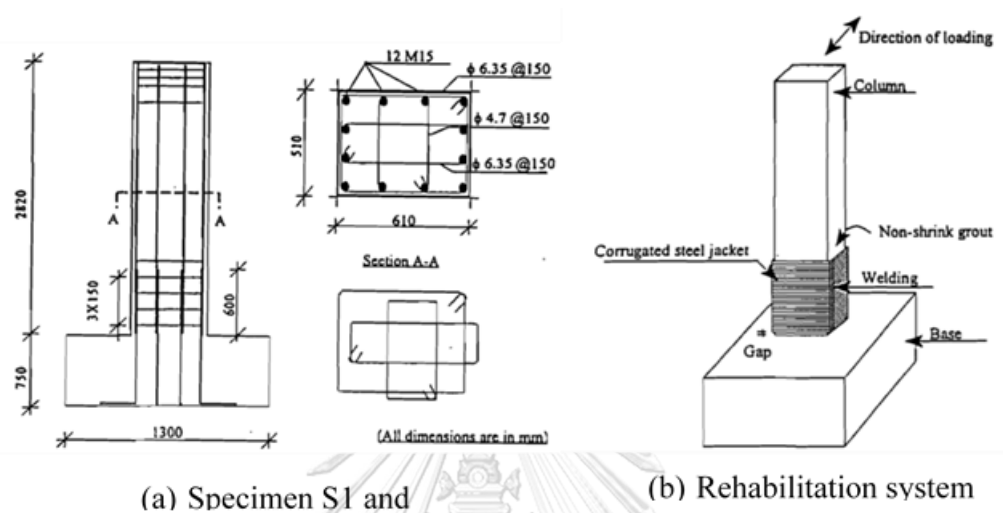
Detail of reinforcement of specimens (Ghobarah et al., 1997)
